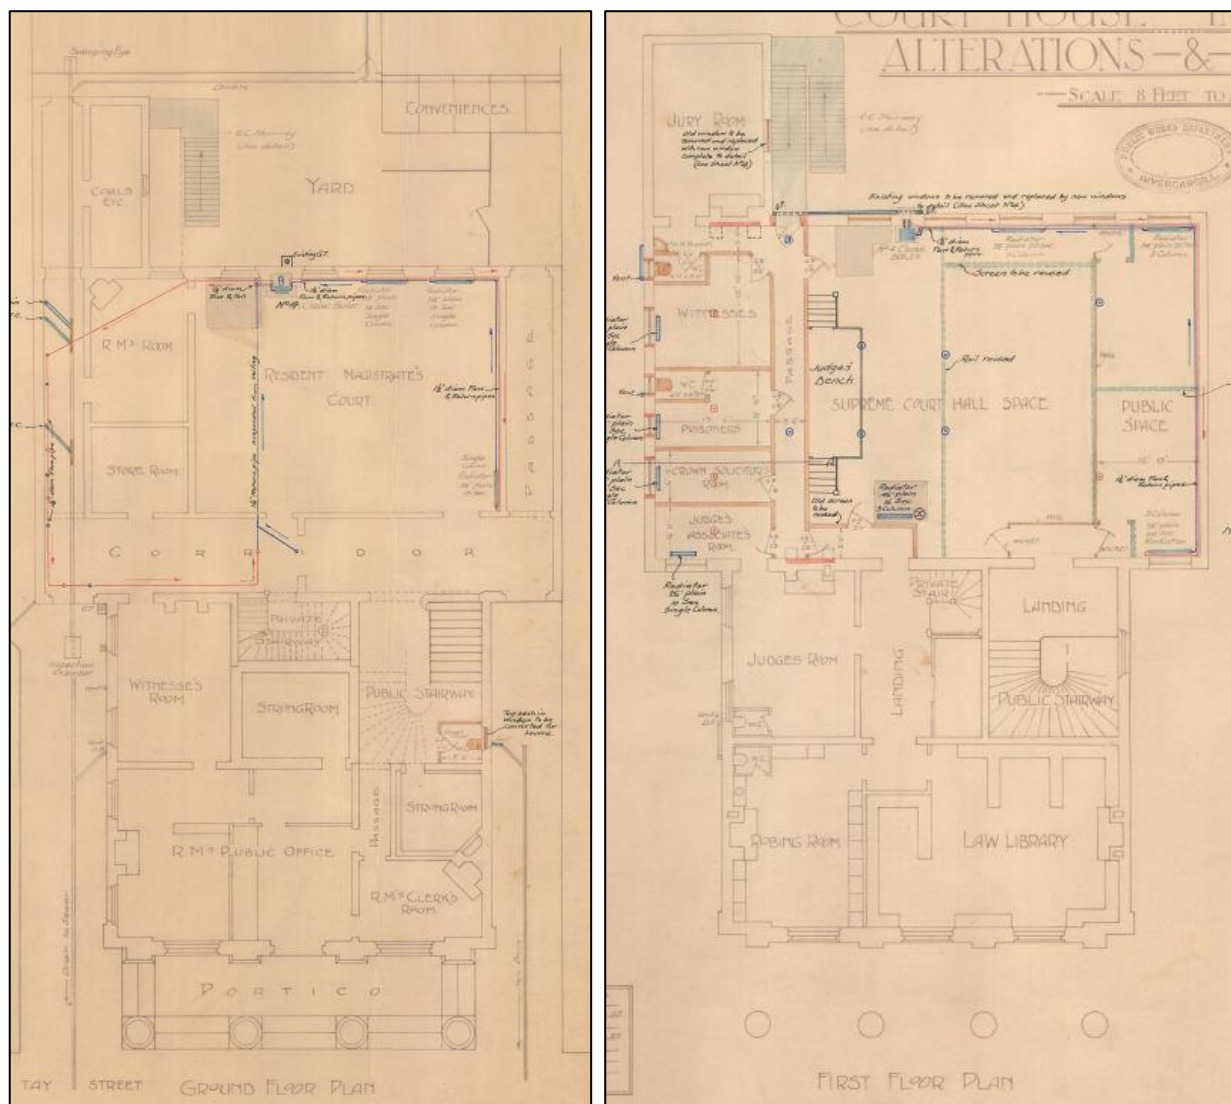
Detail from 1925 plan for alterations to the Invercargill courthouse showing ground (left) and first floor (right) layout (Public Works Office, 1925).
